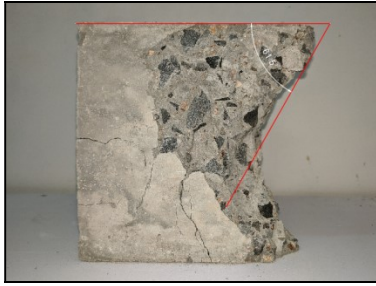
Typical failure of M40 concrete without fibre reinforcement
